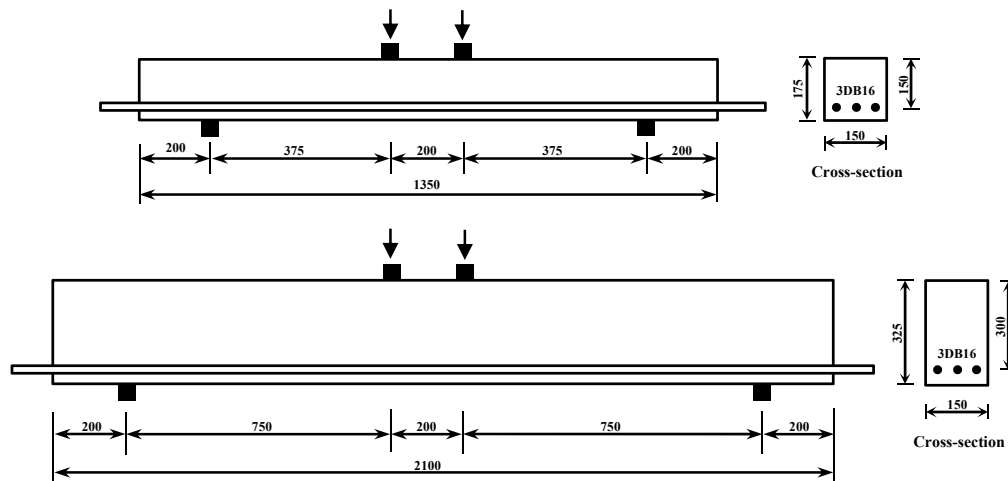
Specimen dimensions and loading points for the shear testing (unit: mm).
